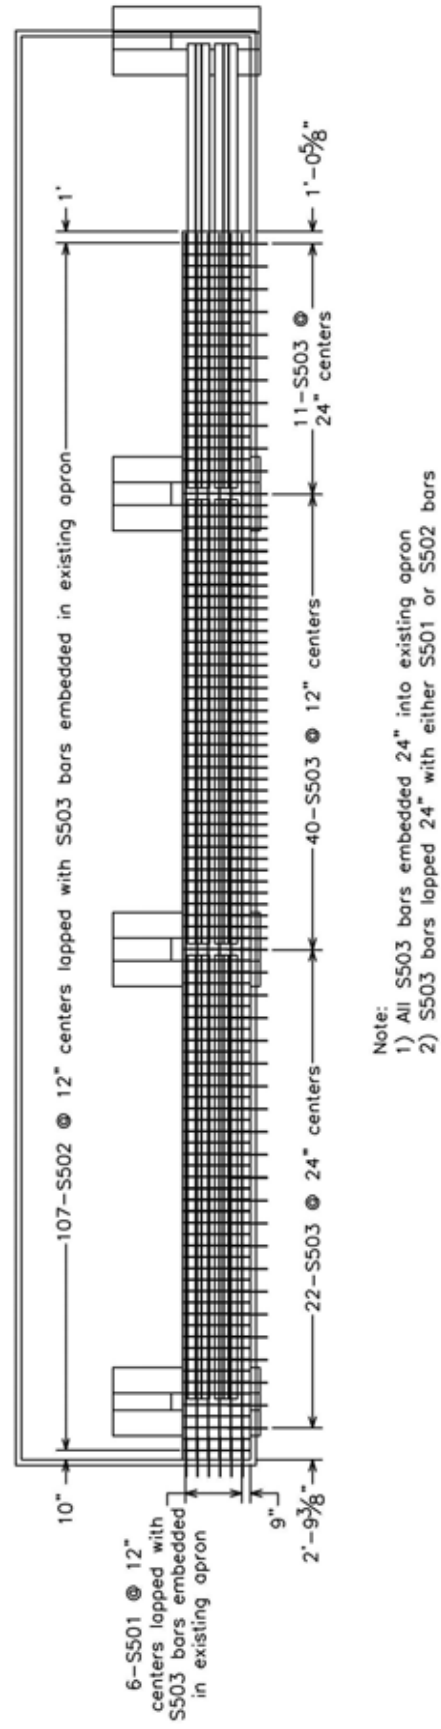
Inverted Tee Bridge Deck System Reinforcement Details (English)
